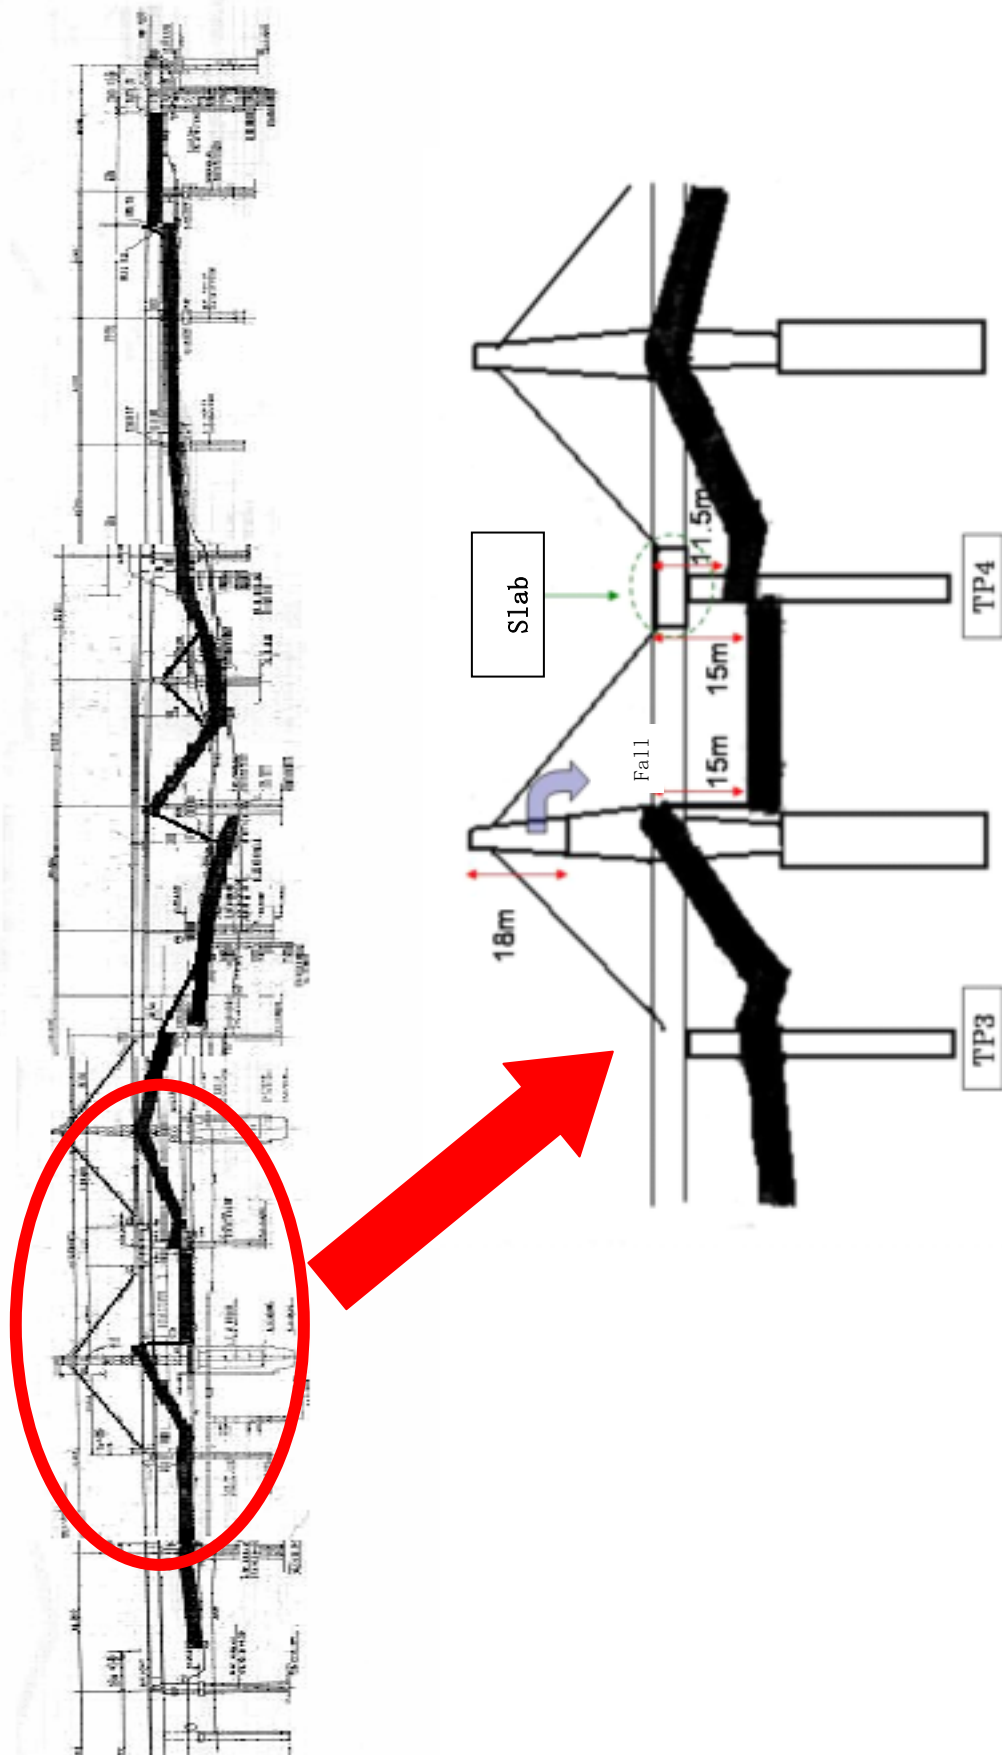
Outline of the structure of New Haengju Bridge and the collapsed part
